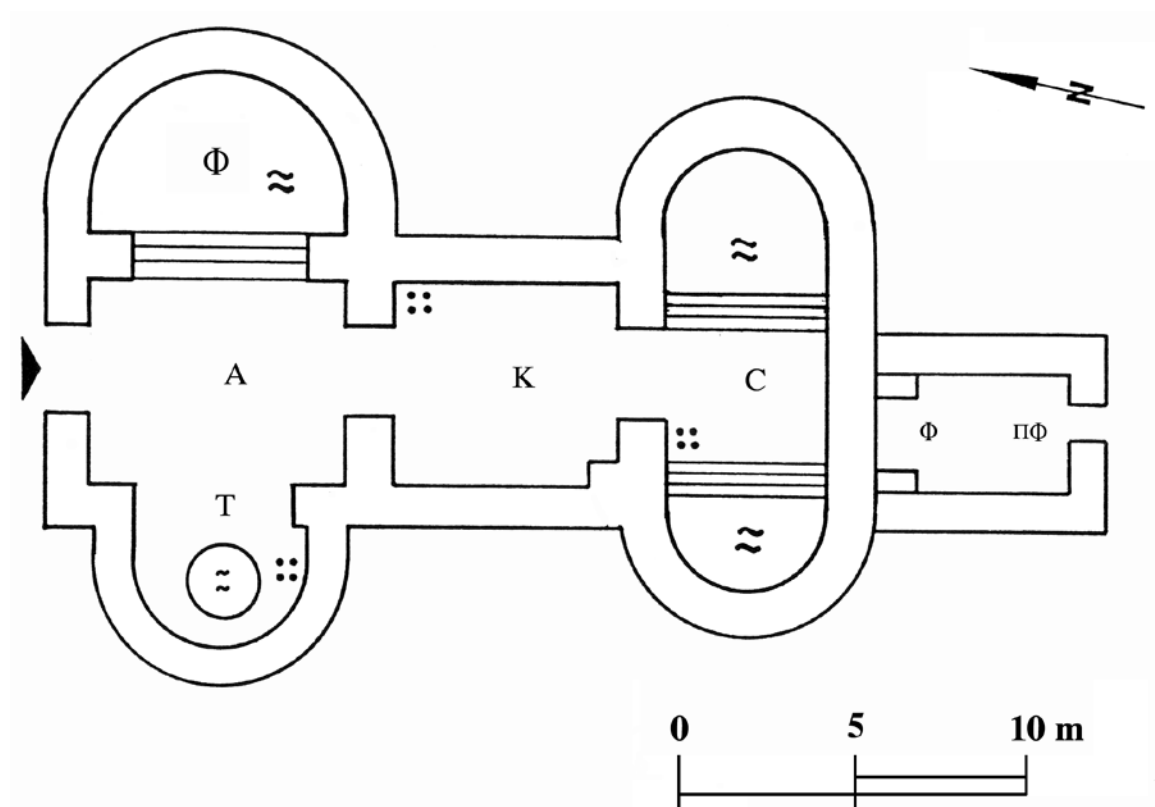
Plan of bath from the 4th century in excavations for flats Mladost 1-2. First building period.
